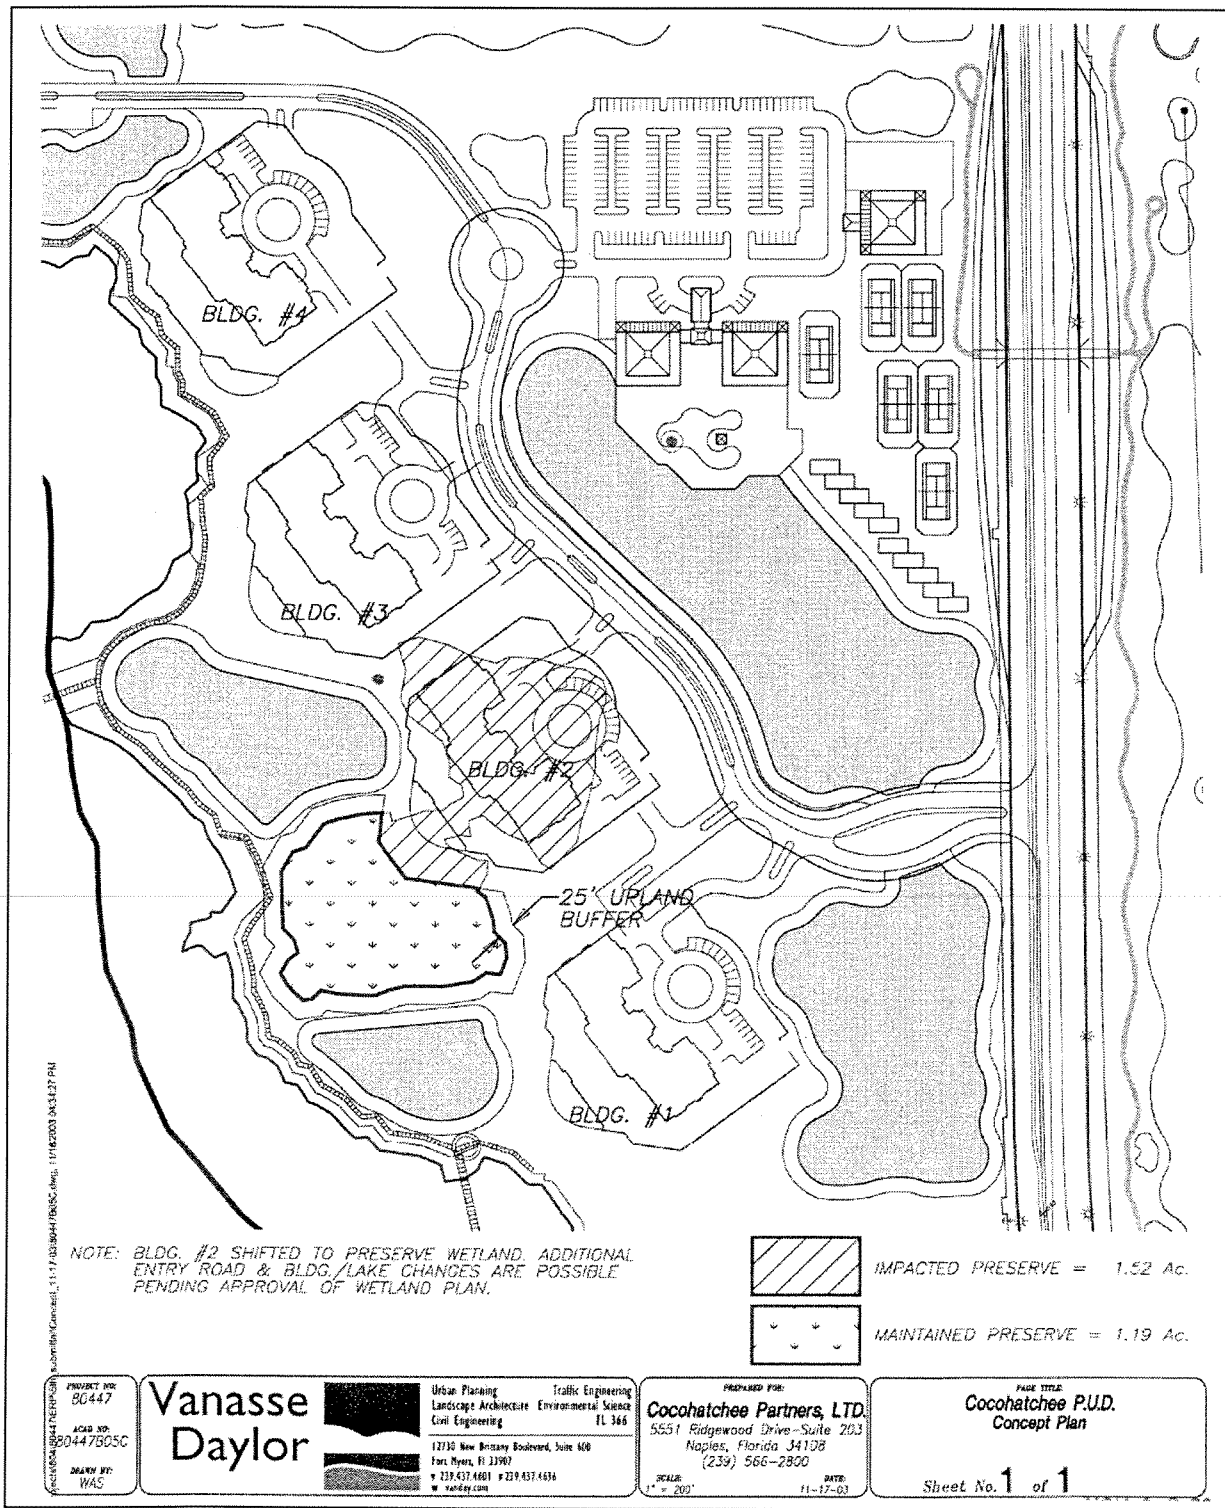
Site plan showing the location of the proposed buildings within the Cocohatchee Development Project.
